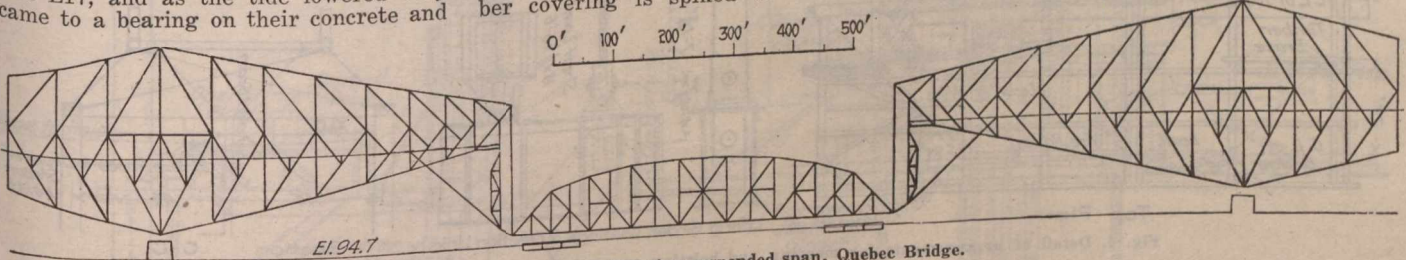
General scheme for hoisting suspended span, Quebec Bridge.
